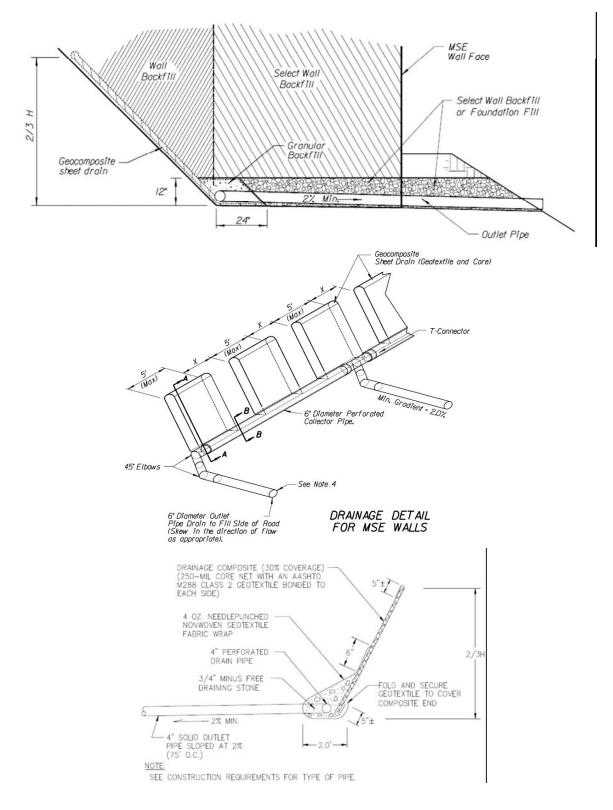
Example drainage detail using a geocomposite sheet drain.
